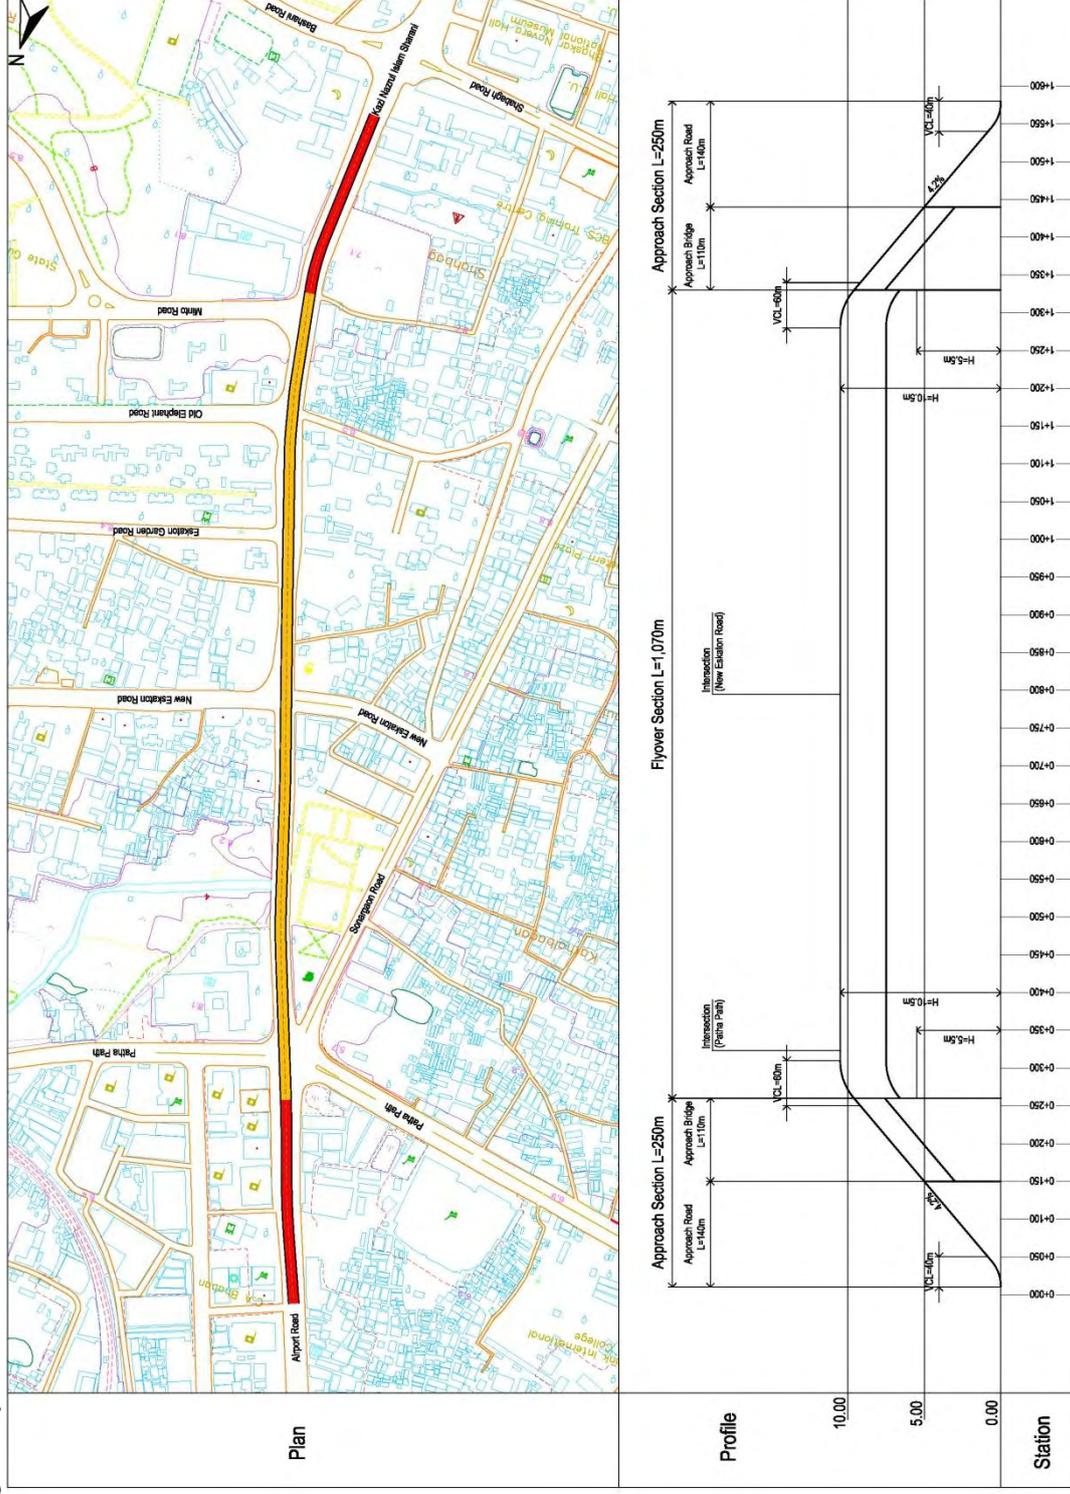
Layout Plan and Profile of Sonargaon Flyover
